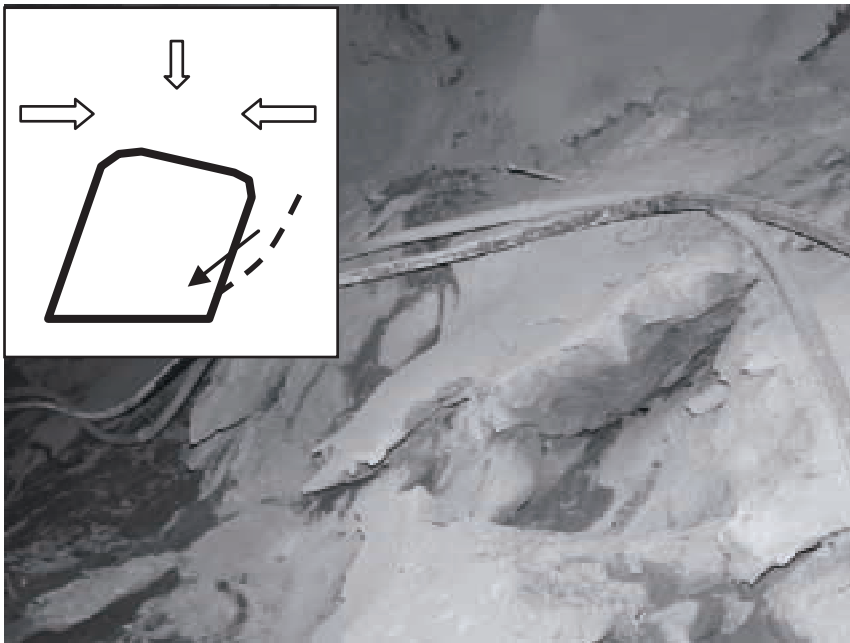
Shear fracture in the foot wall of a mine stope. The rock is chlorite-rich and weak. The sketch to the right illustrates the mode of failure in the foot wall.
